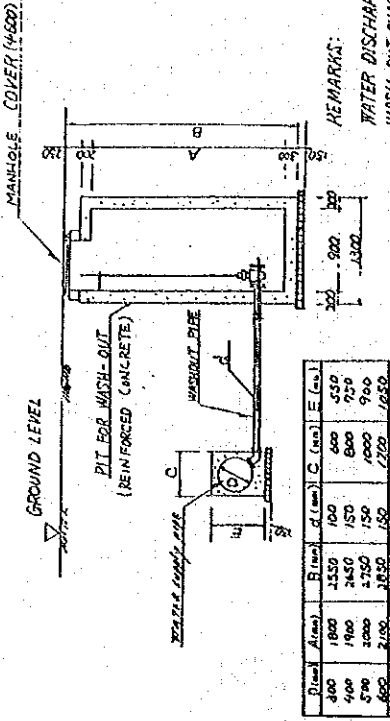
TYPICAL SECTION OF WASH-OUT
